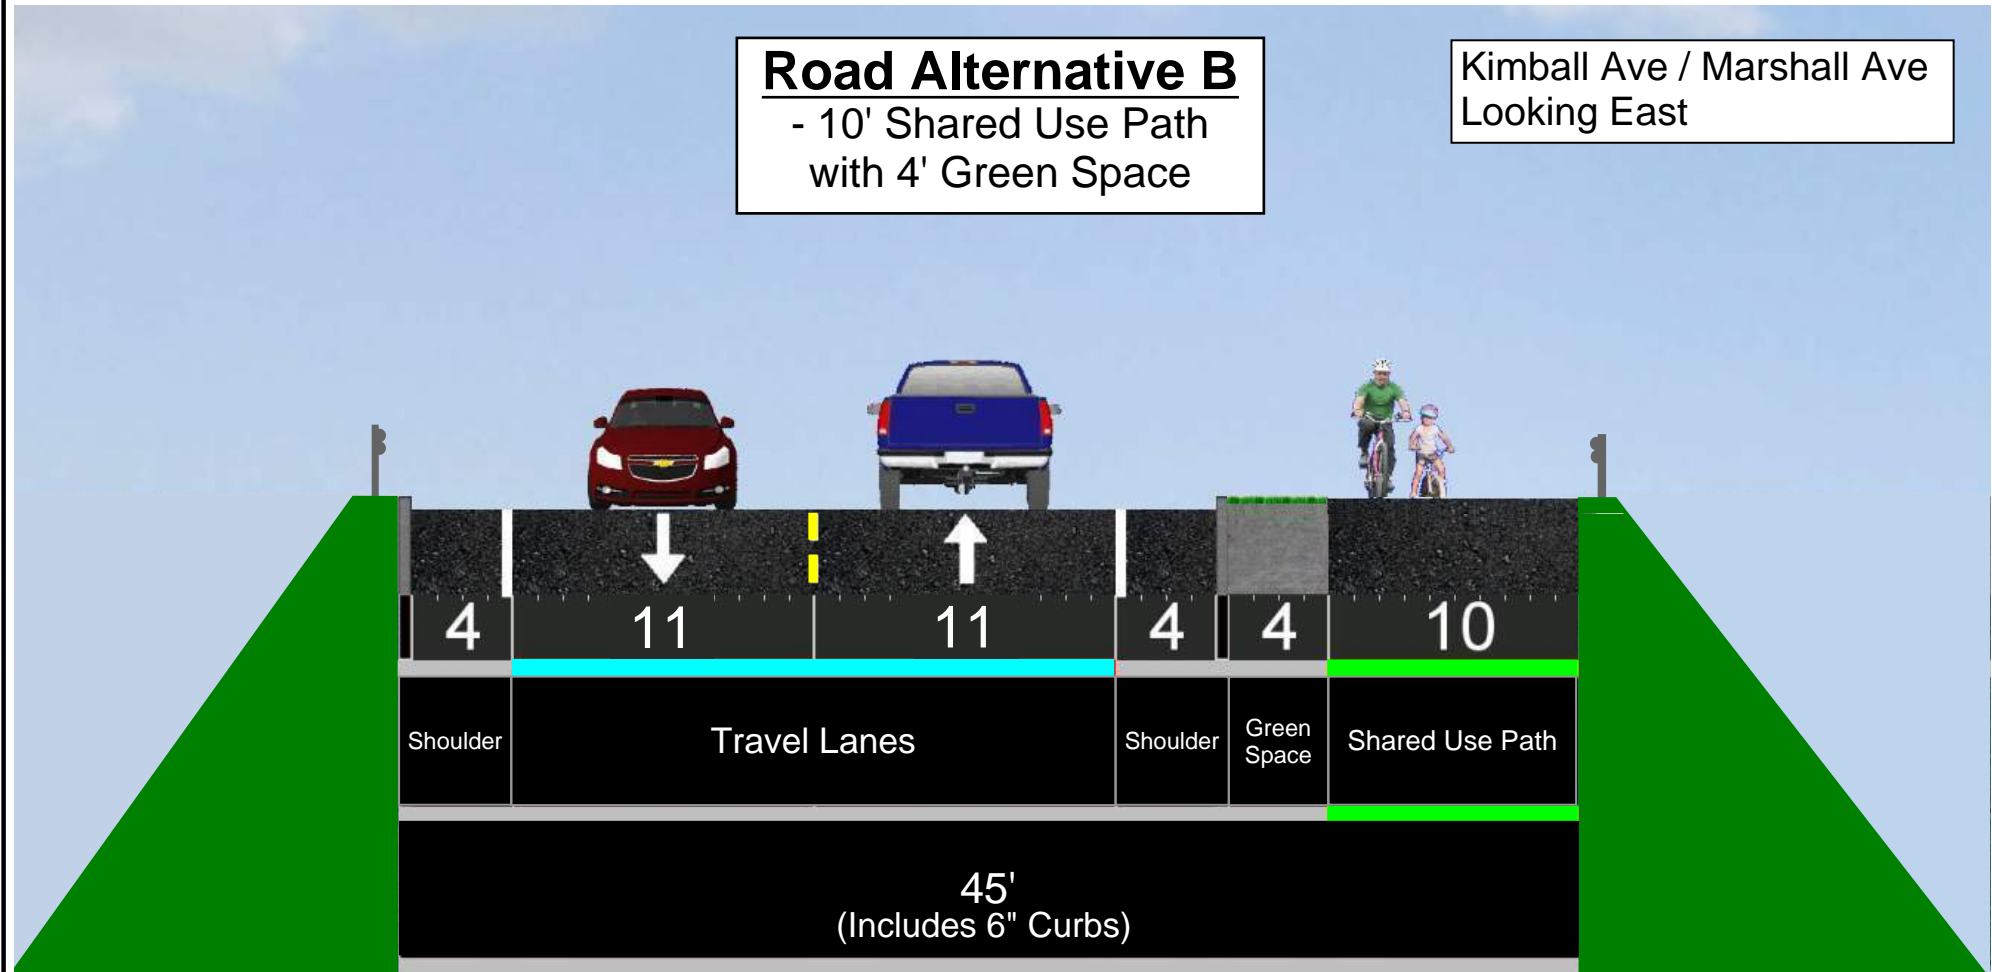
OF 6	2	PROJECT NO. 910909	KIMBALL AVE / MARSHALL AVE		<div>Hoyle, Tanner & Associates, Inc.</div> <div>125 College Street, 4th Floor, Burlington, VT 05401</div> <div>Tel (802) 860-1331</div> <div>www.hoyletanner.com</div>	BRIDGE NO. 16		This document is prepared as an instrument of service and shall remain the property of Hoyle, Tanner. It may not be used, reproduced, disseminated or transferred in any manner, including electronically, for any other purpose than this project, without the written permission of Hoyle, Tanner.
